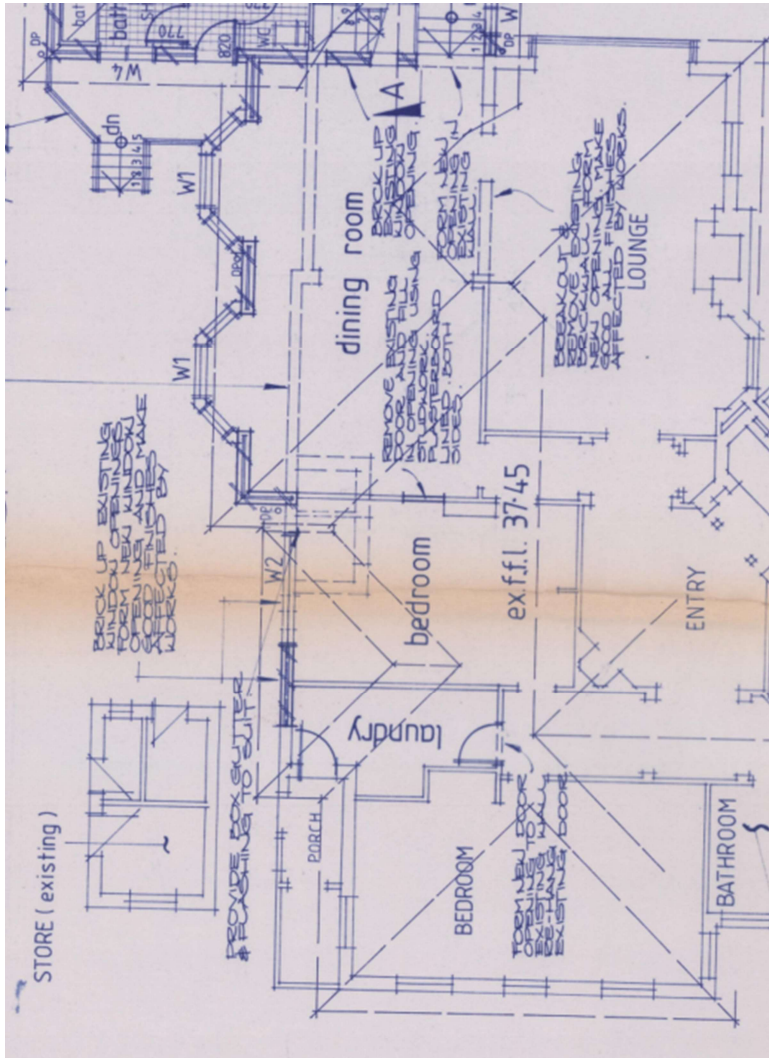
Detail from BP 5665/1991 plans, drawing A1, May 1991. The original line of the west elevation is shown dotted, as well as the construction of two new canted bay windows (marked W1), and infill of an original window to the laundry. Note that the freestanding 'store' has since been removed.
